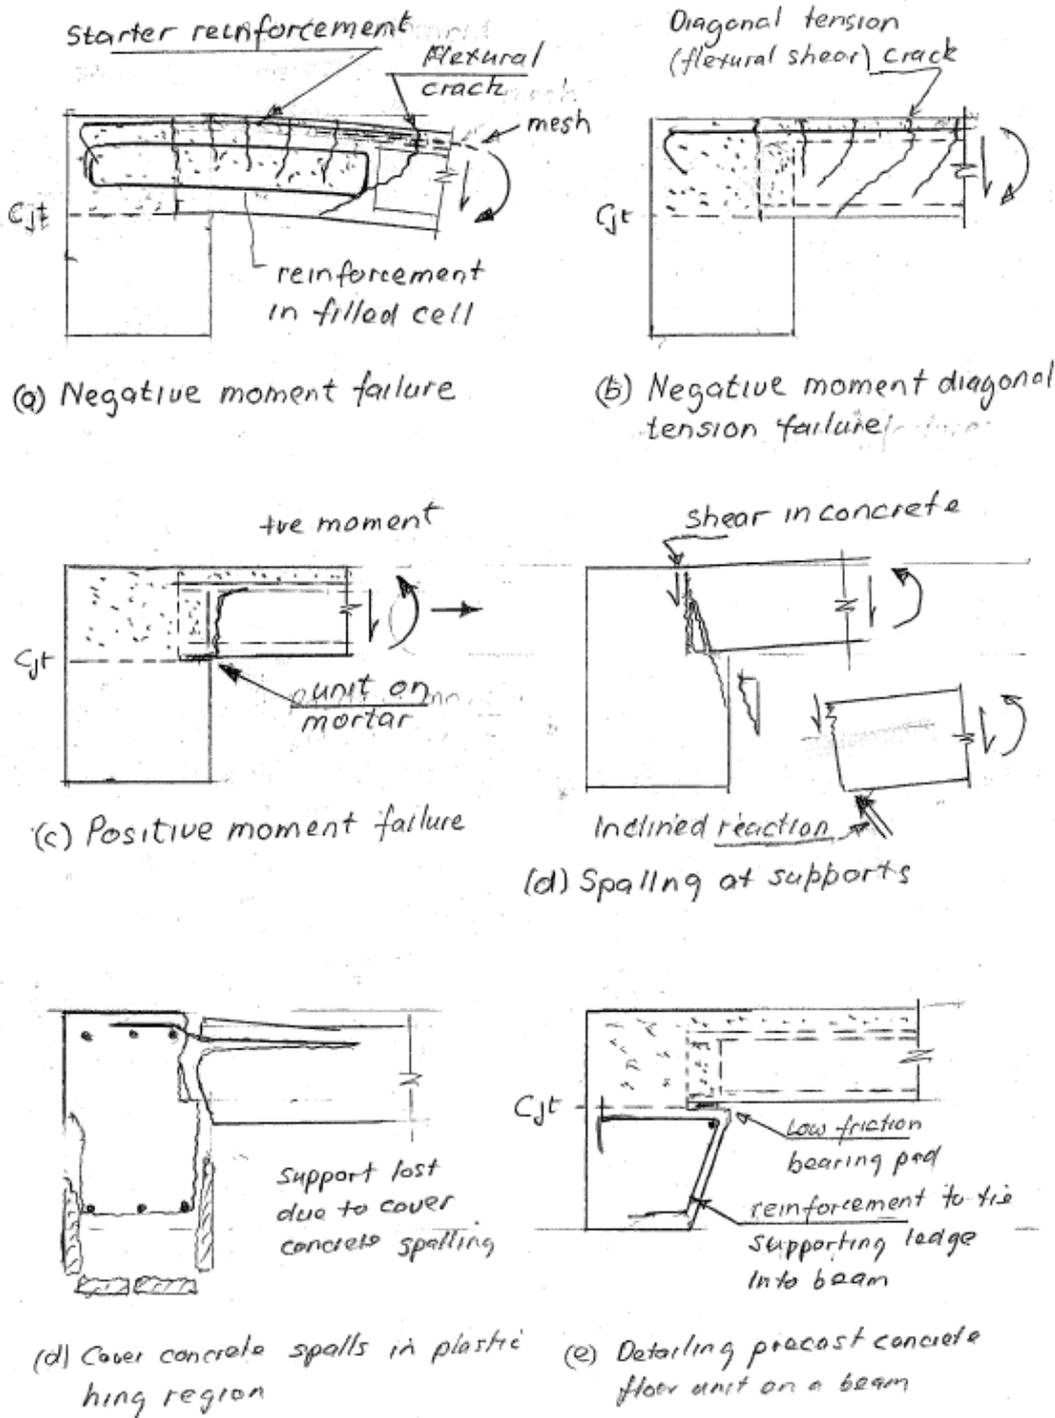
(c) illustrates the case where the positive moment strength at the support detail is greater than the positive flexural strength of a hollow-core unit close to the support. This situation can occur when the hollow-core units are mounted on mortar, which together with infill concrete in the end 75 mm of the unit allows significant flexural tension to be transmitted into the soffit of the unit to generate a flexural tension crack. At this location the pretension strands are not developed to an appreciable extent and consequently they are ineffective at resisting the flexural tension force. At this location, the positive moment flexural strength is limited by the tensile strength of the concrete. A positive moment flexural crack in this location will widen due to rotation of the supporting beam and elongation of plastic hinges in beams. When the crack reaches a critical width collapse occurs.
